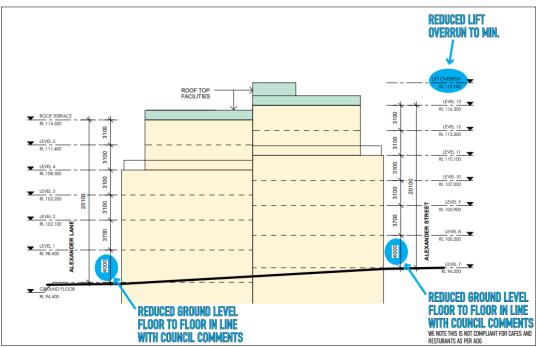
Revised Building Height (Applicant's response to NSLPP recommendations, p.4)
